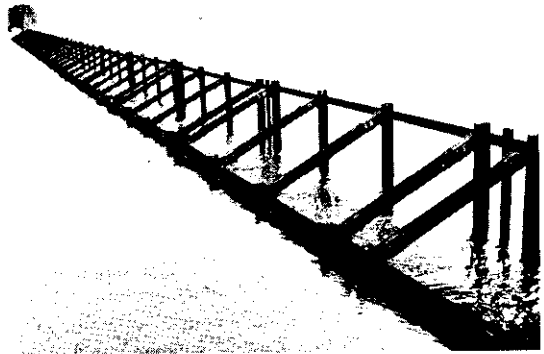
Simplified steel blocks settled in the sea (K-H C type)
